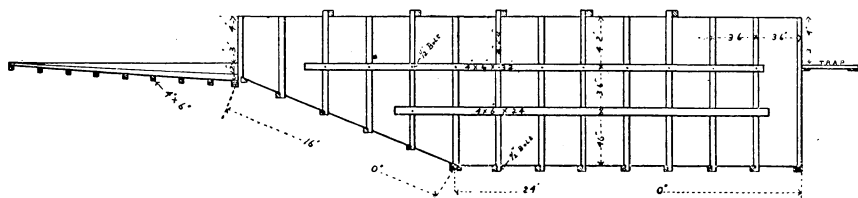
Side view of dipping vat, showing inclined egress and dripping floor.
